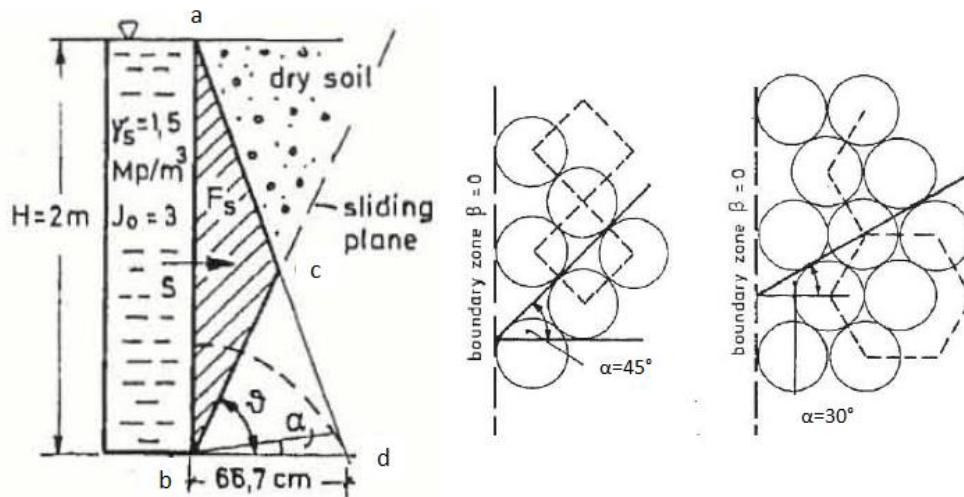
Left - Sketch of slurry supported open trench with slurry penetrated area (abd) and the slurry penetrated area which is stabilizing the trench (abc) Right – Mechanism of the single grain sliding out of the wall for $\alpha = 30^\circ$ and 45° (Müller-Kirchenbauer, 1972)
